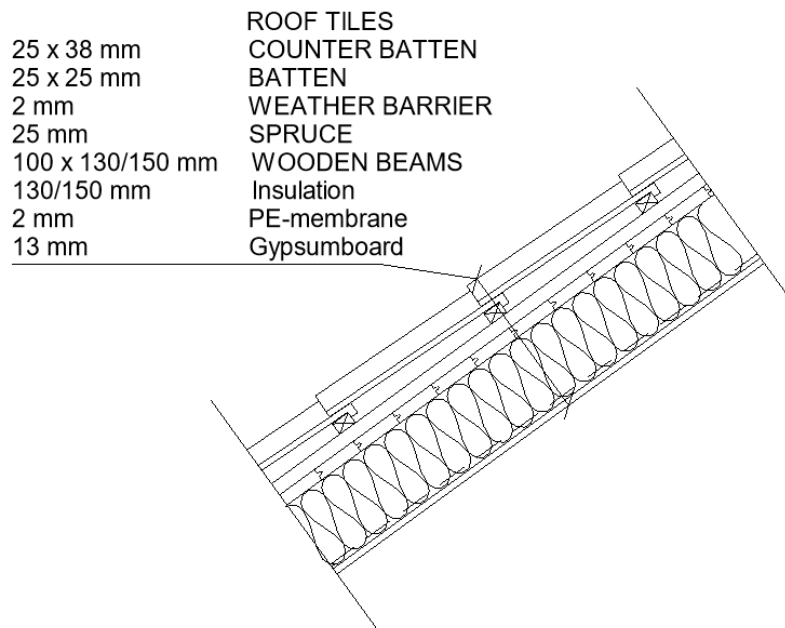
Roof construction when adding insulation, PE membrane, and gypsum board.
